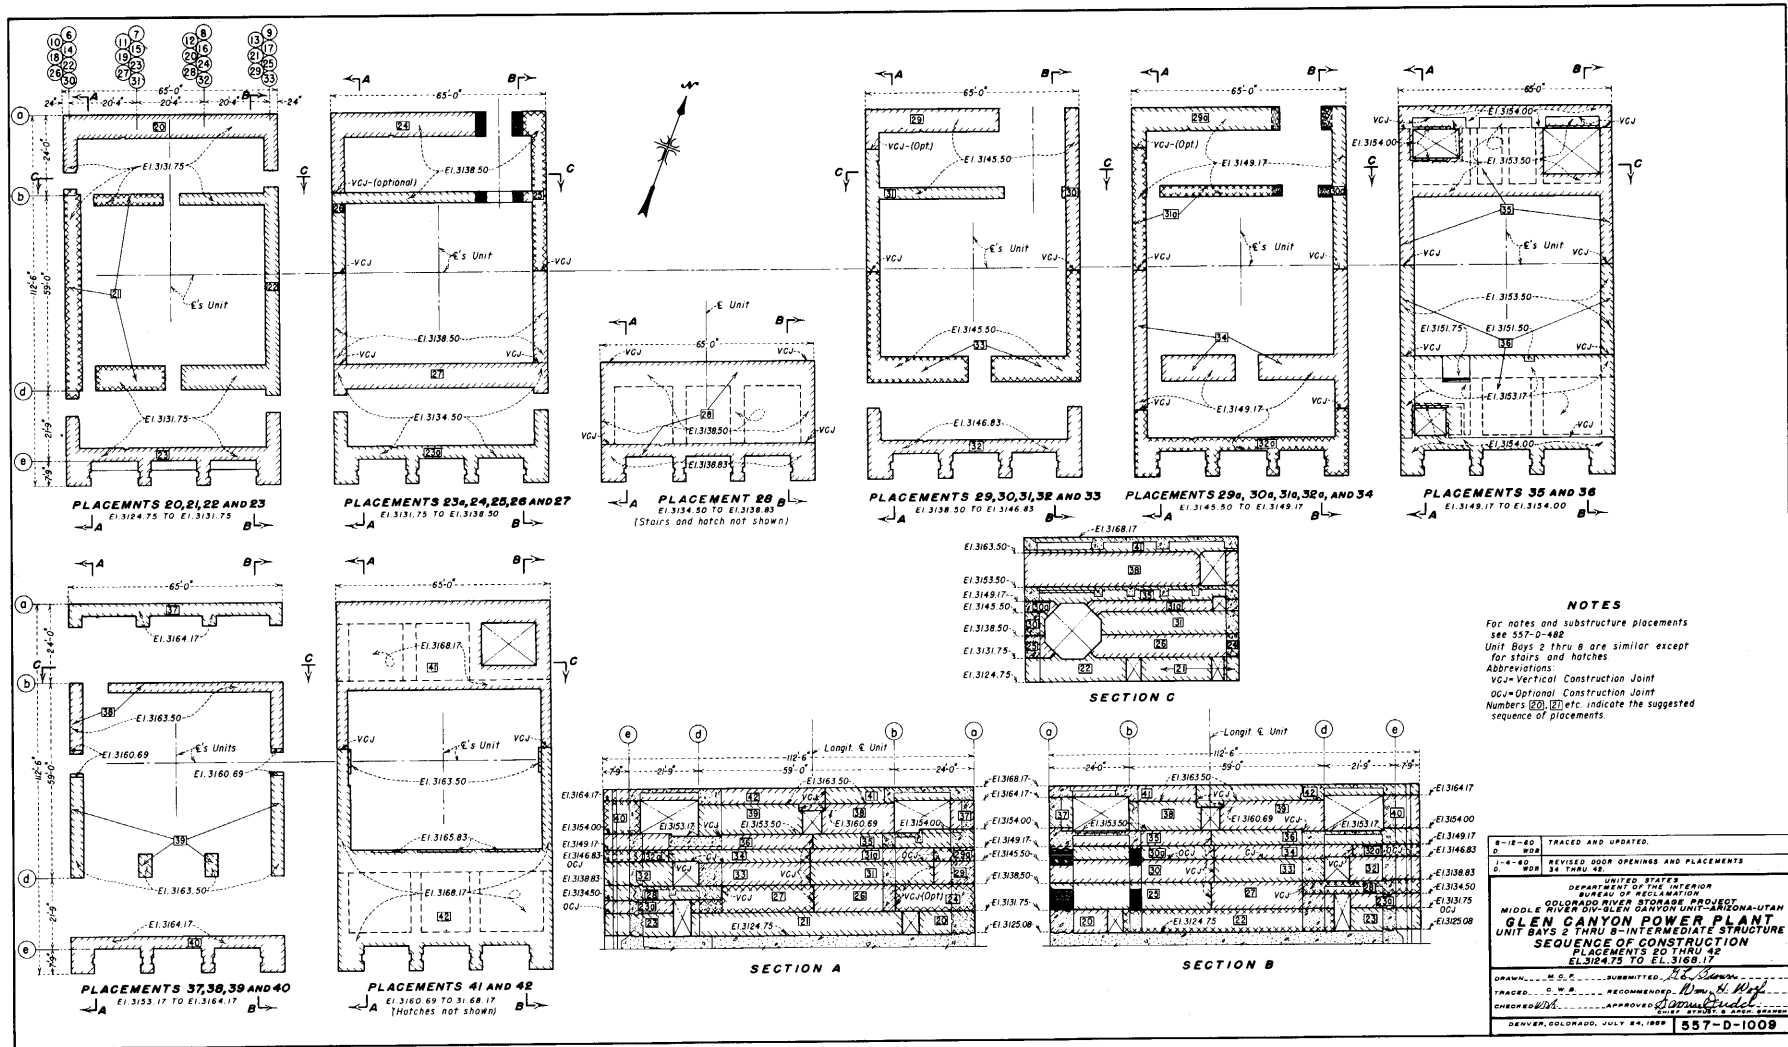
Powerplant unit bays 2 through 8 intermediate structure sequence of construction for placements 20 through 42—Elevation 3124.75 to elevation 3168.17.
